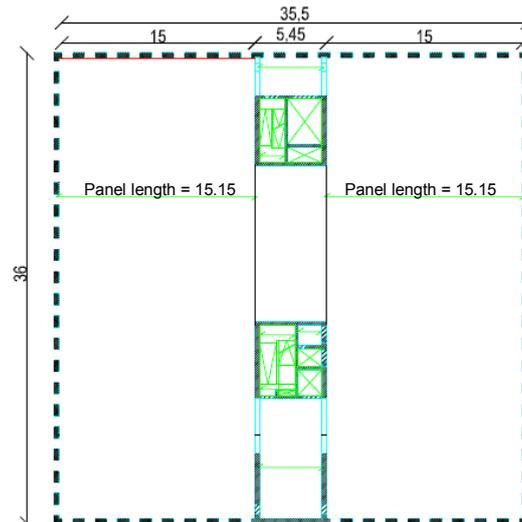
Structural arrangement of the floor of the data center (dimensions are in meters)
